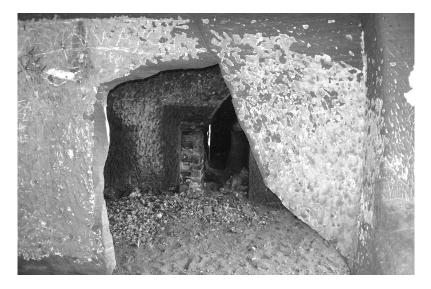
Thin internal walls dividing rooms at Drakelow, east group, the holes in the walls are due to vandalism.
